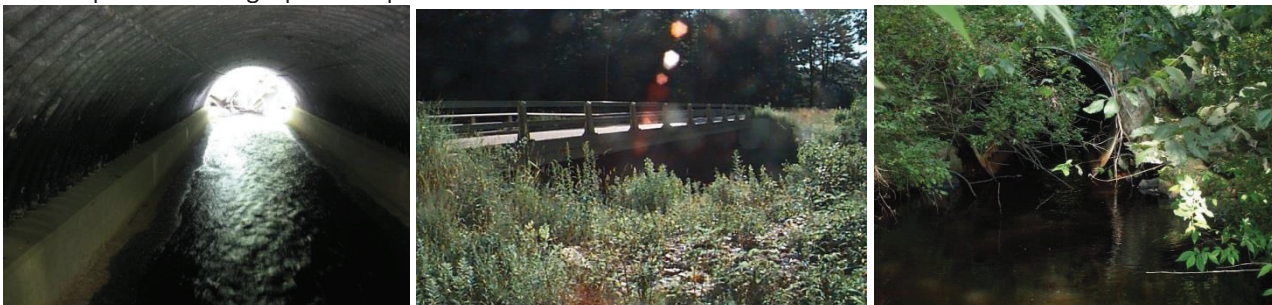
(metal pipe culvert) would be acceptable as supplemental information, but not as an overall view of the bridge/culvert. Photos 2 and 3 are heavily vegetated and the structures are obscured.
